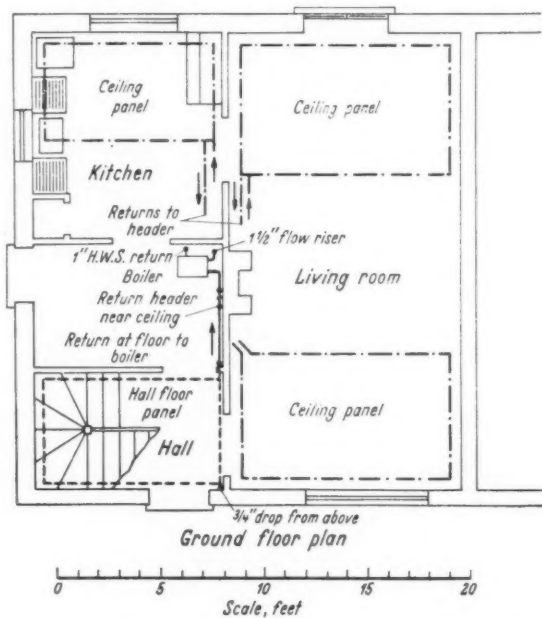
System 5, embedded ceiling panels (ground floor).
